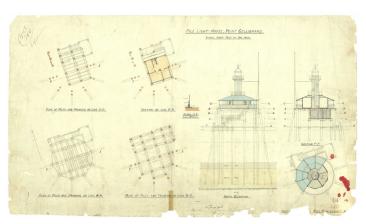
Pile Light House, Port Gellibrand, contract drawing signed 22 January 1906, PROV, VPRS 16723/P1.
